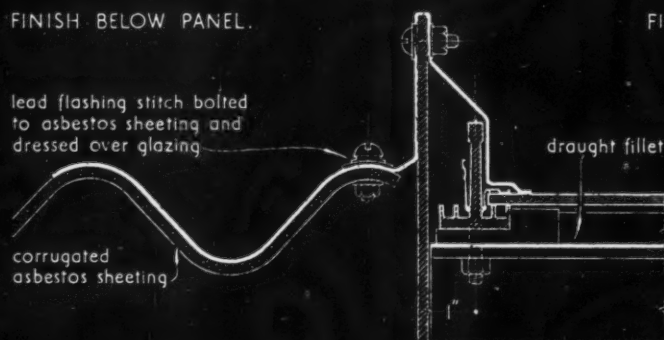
DETAIL OF GLAZED PANEL IN STEEL ROOF OF NORMAL PITCH.
